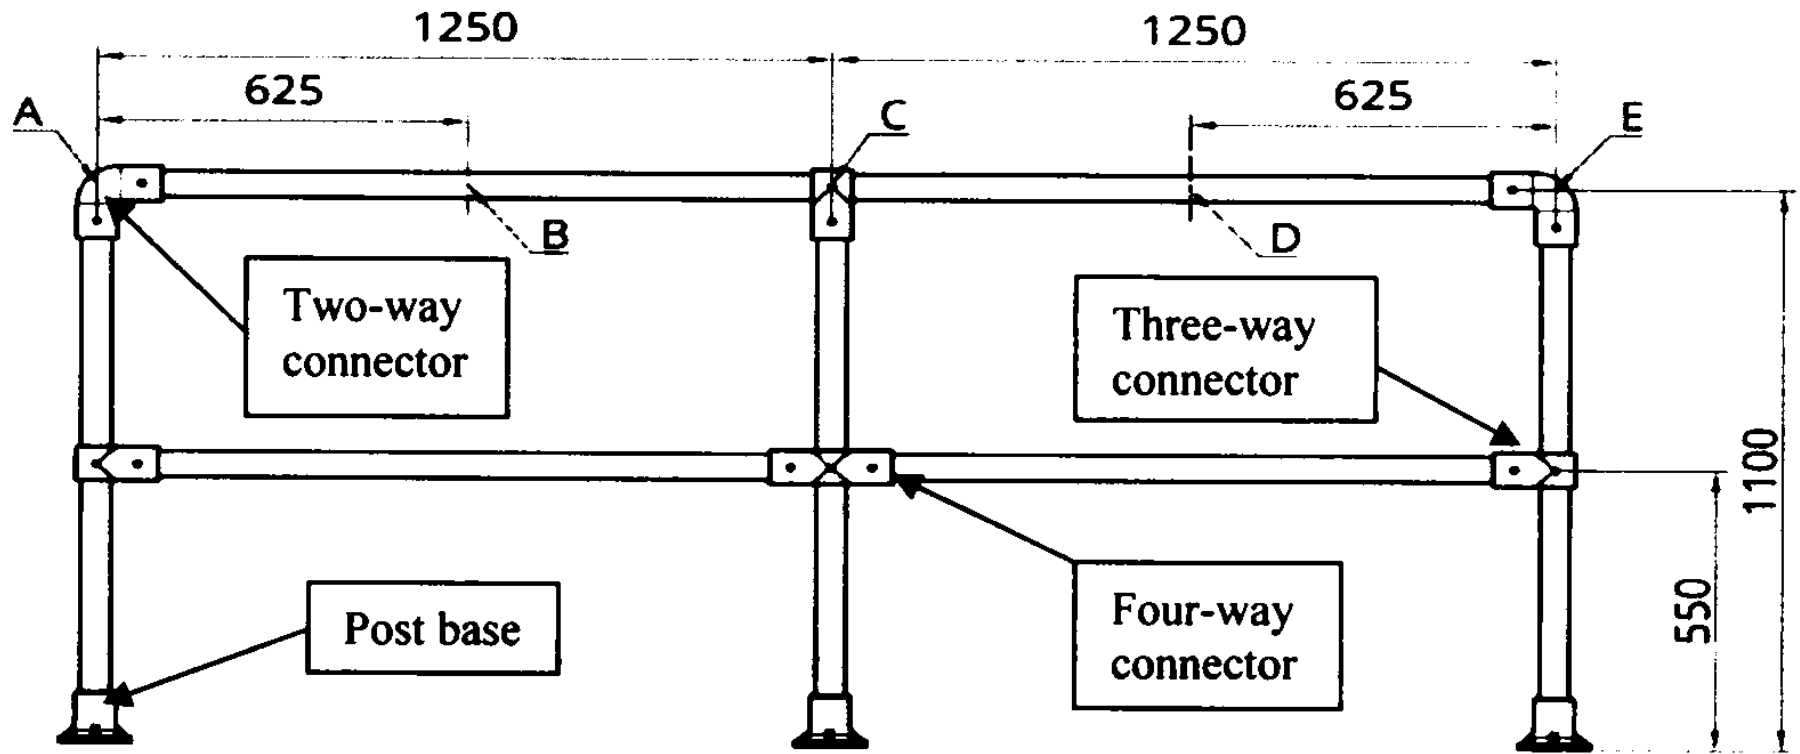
Overall view of the two-bay pultruded GFRP guardrail connected to the laboratory strong floor
